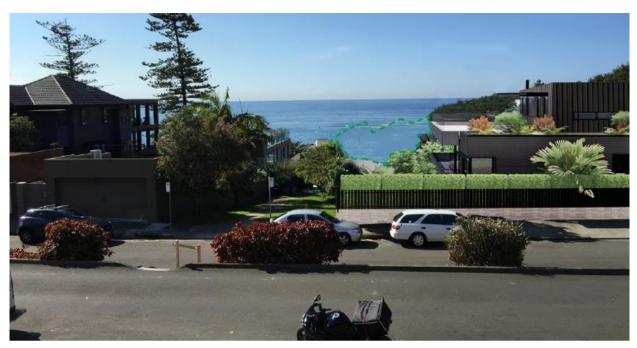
Proposed view from Apt 2/28 Reddall Street, Ground Level Balcony (Source: Squillace Architects)
